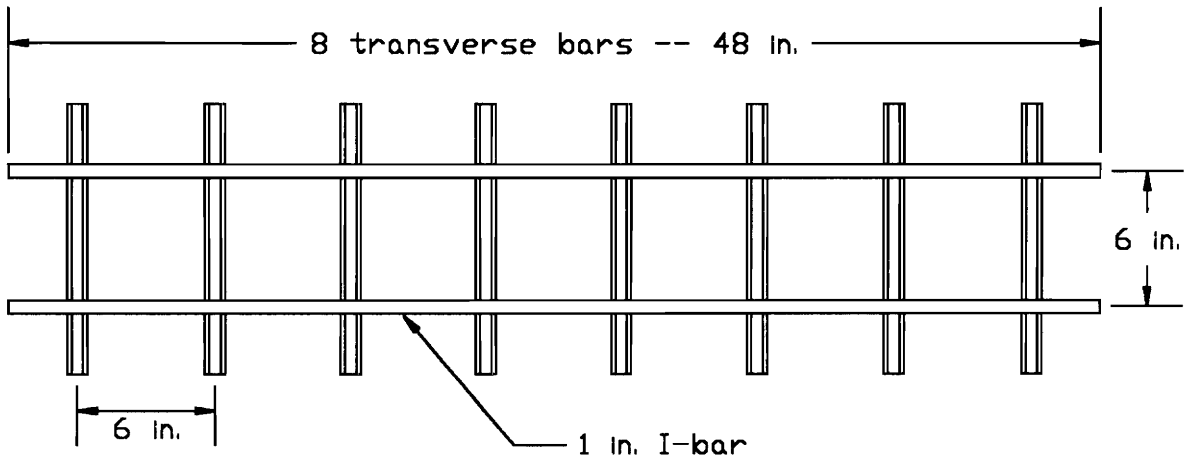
Bar Layout for Duragrid (6 in.) Reinforced Beams
